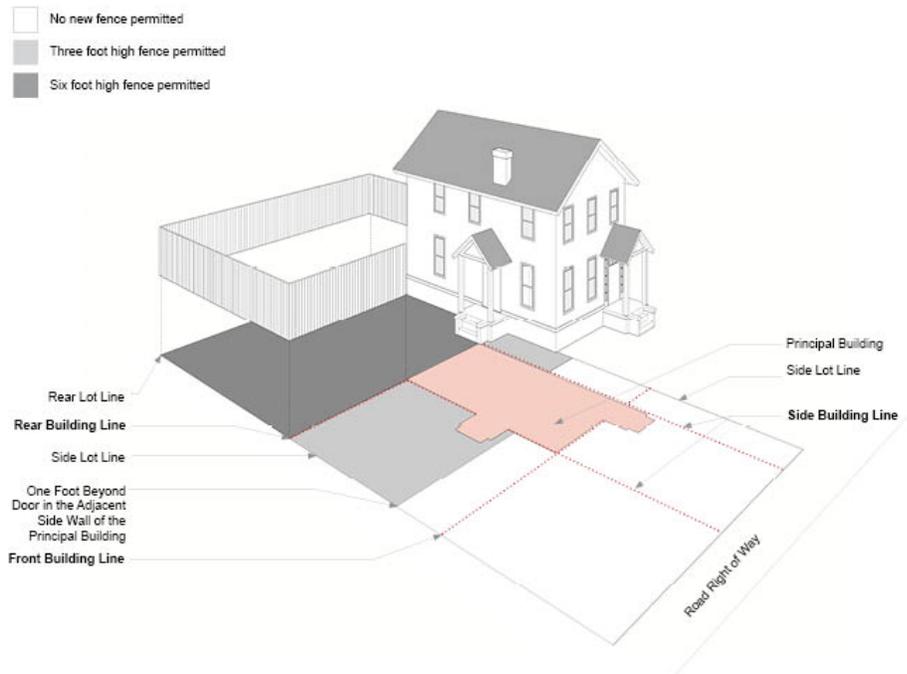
b: House on Interior Lot- Fence Behind Door in Adjacent Side Wall Option A
